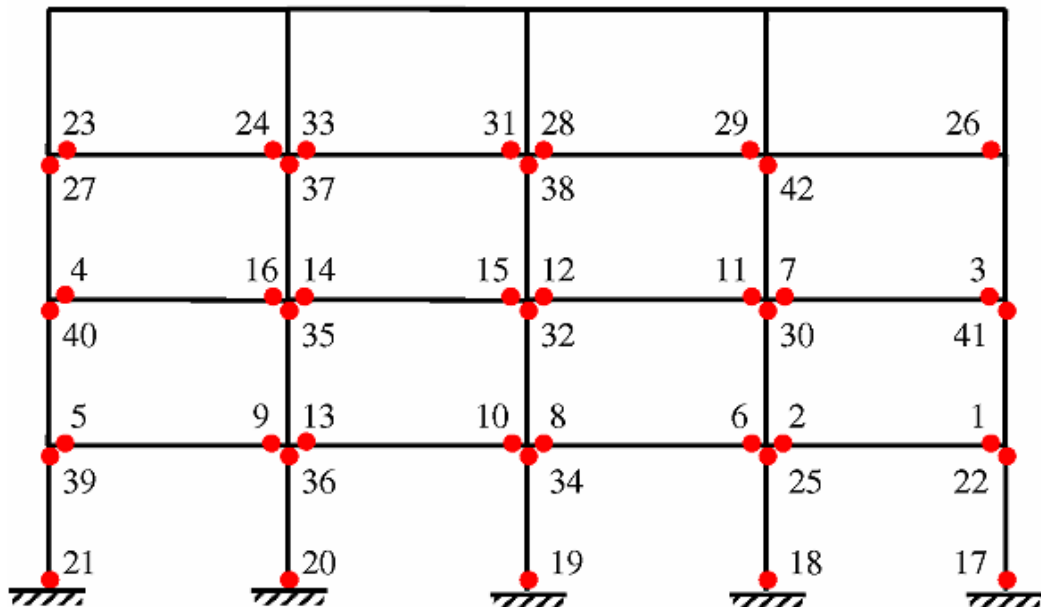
Hinge Formations for Structural Frame without Wall under $0.2N_0$ Axial Load and Linear Geometry
